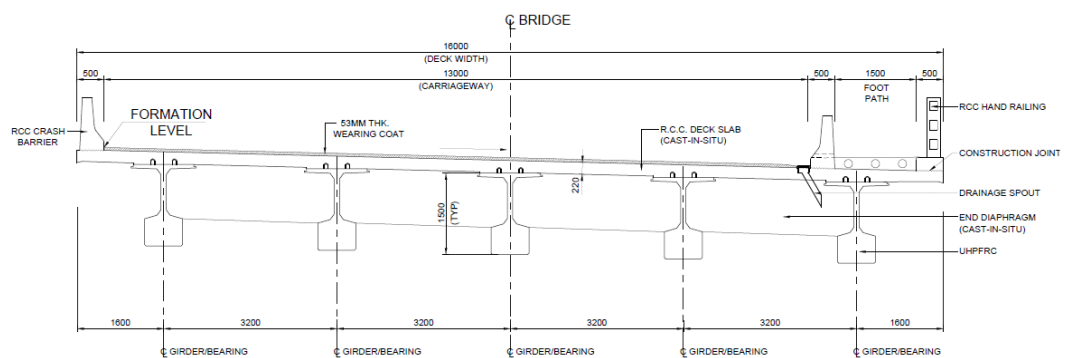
30 Cross section of 35m span UHPFRC post tensioned I girder at support
